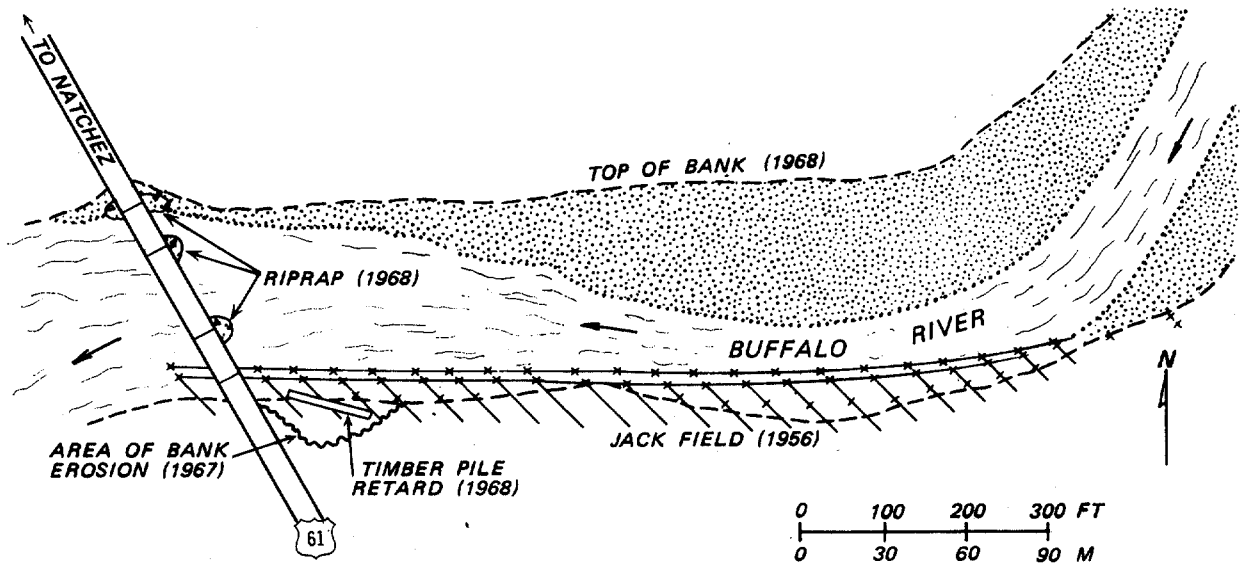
Plan sketch showing countermeasures at US-61 crossing.
